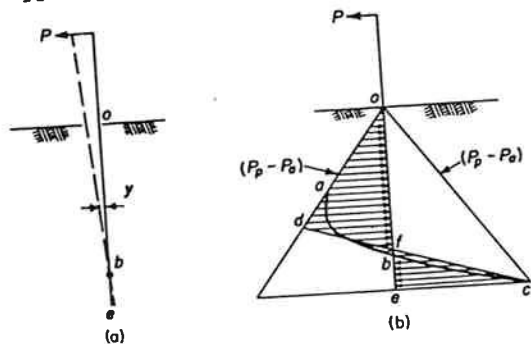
Example illustrating earth pressure on cantilever sheetpiling.
